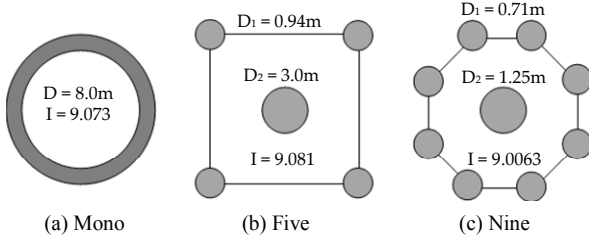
Arrangement of CFMP (Concrete Filled Multi-Piles)
